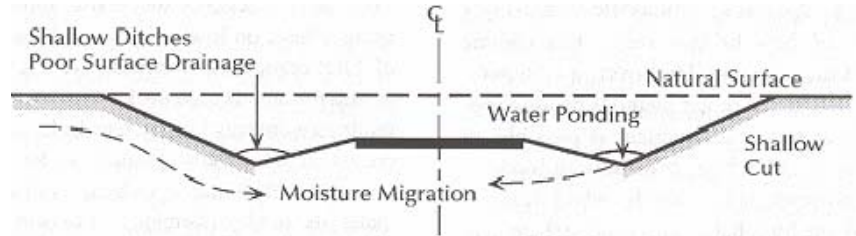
Potential drainage problems associated with depressed pavement construction
